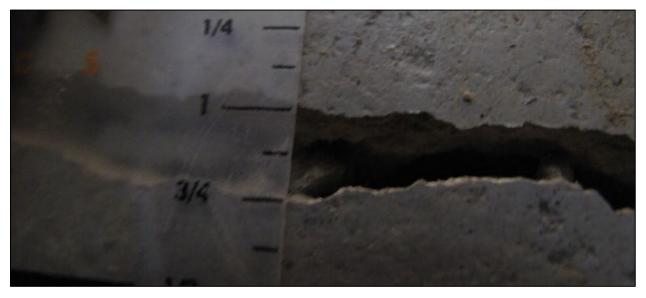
Concrete slab crack with sharp angular edges in close proximity to the fire riser As is often present in older structures of similar construction, the authors observed numerous other concrete cracks in the slab that exhibited rounded and worn edges (Figure 8). These cracks were typically located farther away from the fire riser and were not indicative of a recent event.
